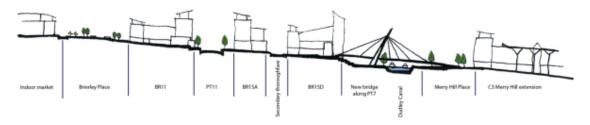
Cross Section from Indoor Market to Merry Hill Extension
